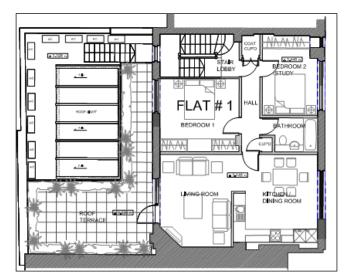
(left): Flat 1 on the first floor of 175 Cleveland Street. The windows on the right side of the plan face the application site. The kitchen/dining area connects to the living room, which benefits from rear windows and a roof terrace. Bedroom 2/study is served by two windows and is a box room.
